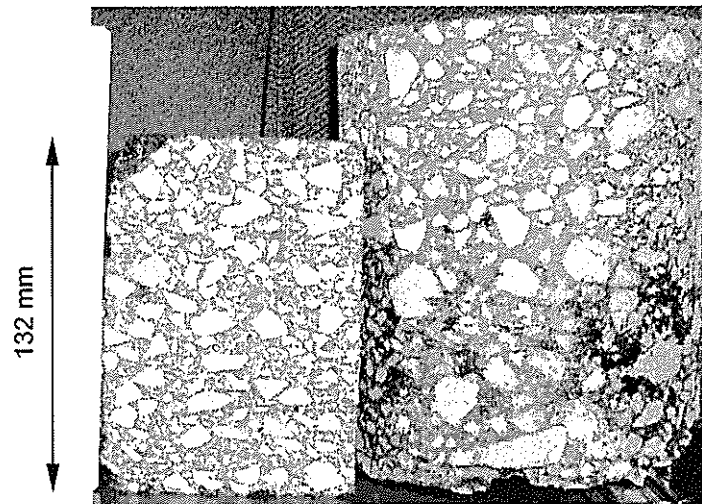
Ohakea Asphalt Core (left) and Mix 14 Superpave Overlay on Transit NZ Mix 20 (AIAL) (right).
